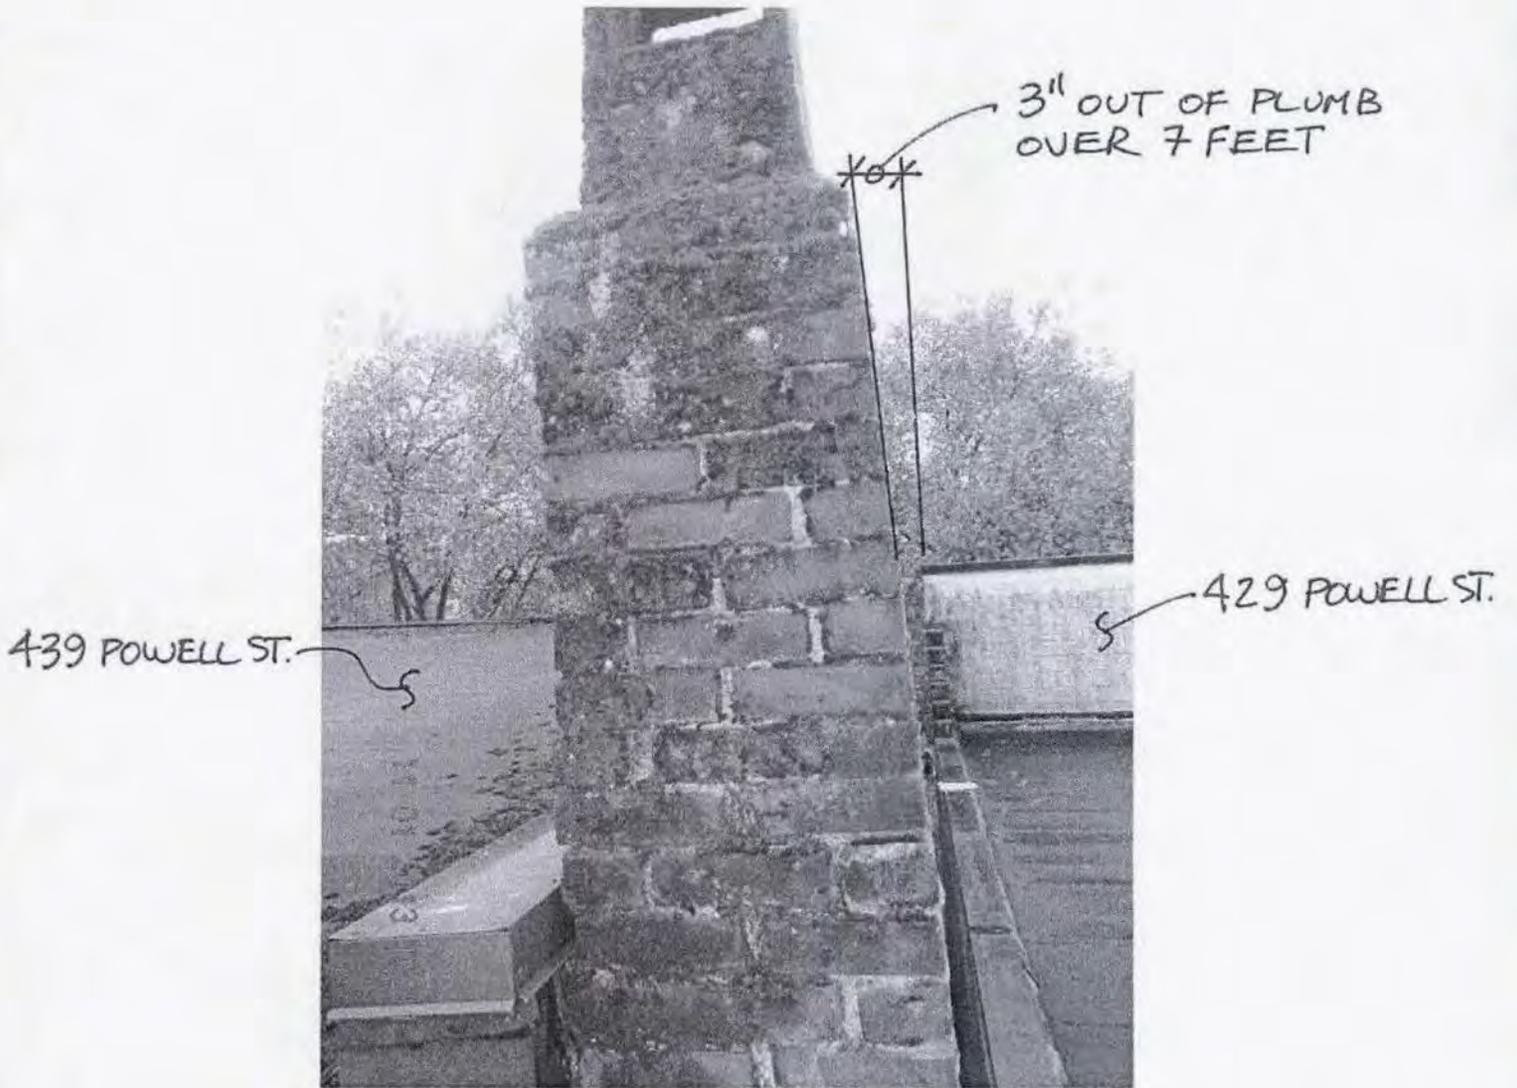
Chimney Out of Plumb on West Elevation of 439 Powell Street, Vancouver
